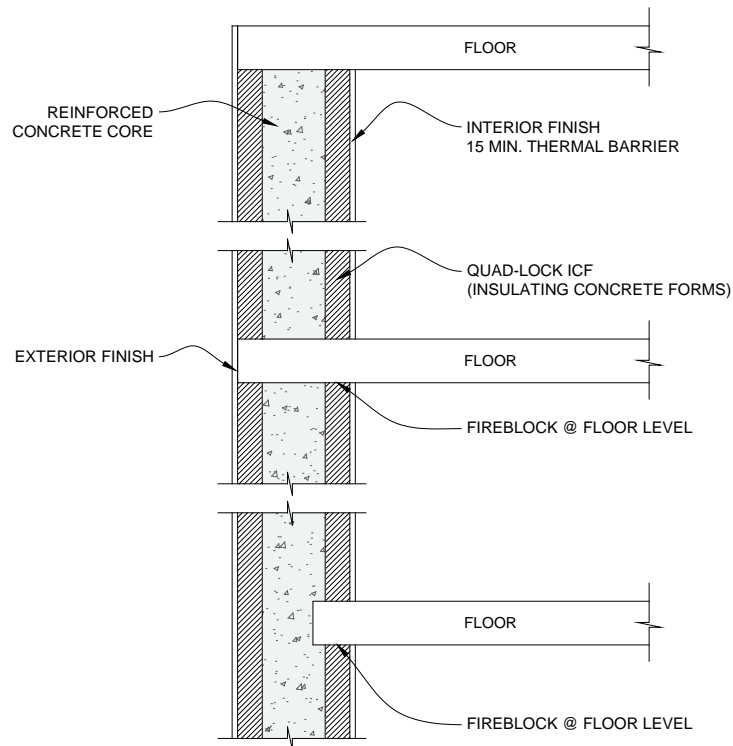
FLOOR CONNECTIONS FOR TYPES I – IV CONSTRUCTION
